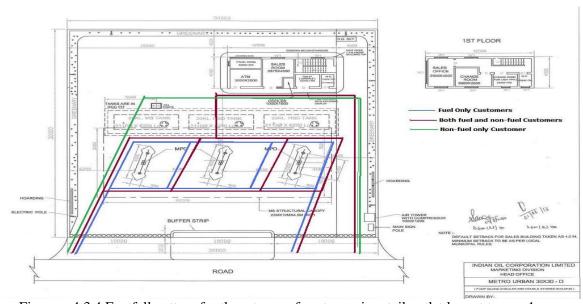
Footfall pattern for three types of customer in retail outlet layout type -1.
